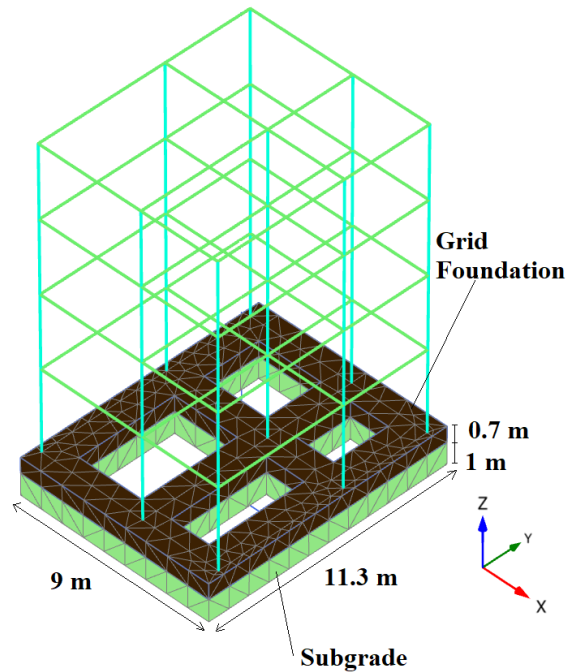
Model of typical foundation on the project site: grid foundation overlying the subgrade
